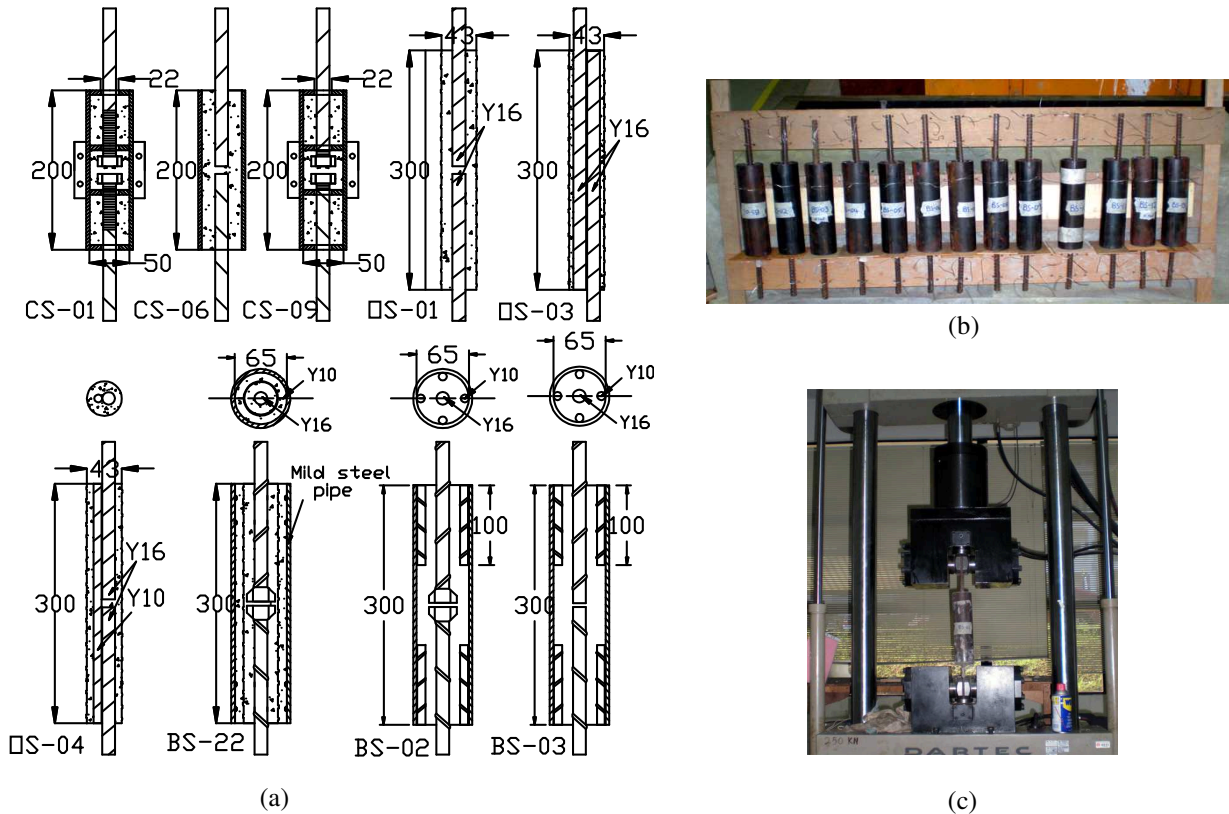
(a) Details of tested specimens (b) Preparation of specimens (c) Tensile test of specimen
